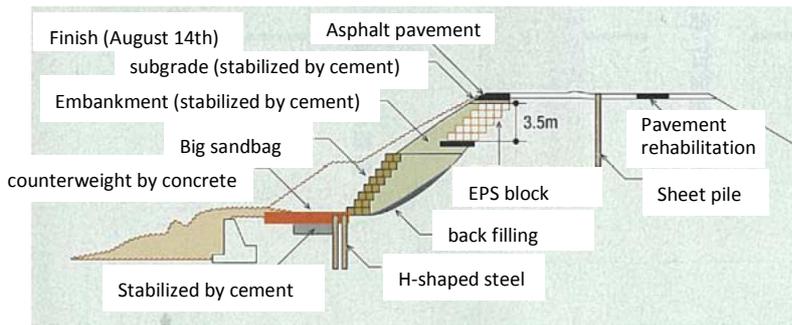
Emergency rehabilitation work plan design in cross-section^[3]
